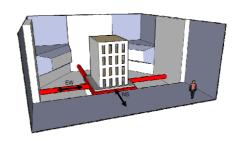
Overview of the building prototype before test and test setup (Candeias, 2008).
